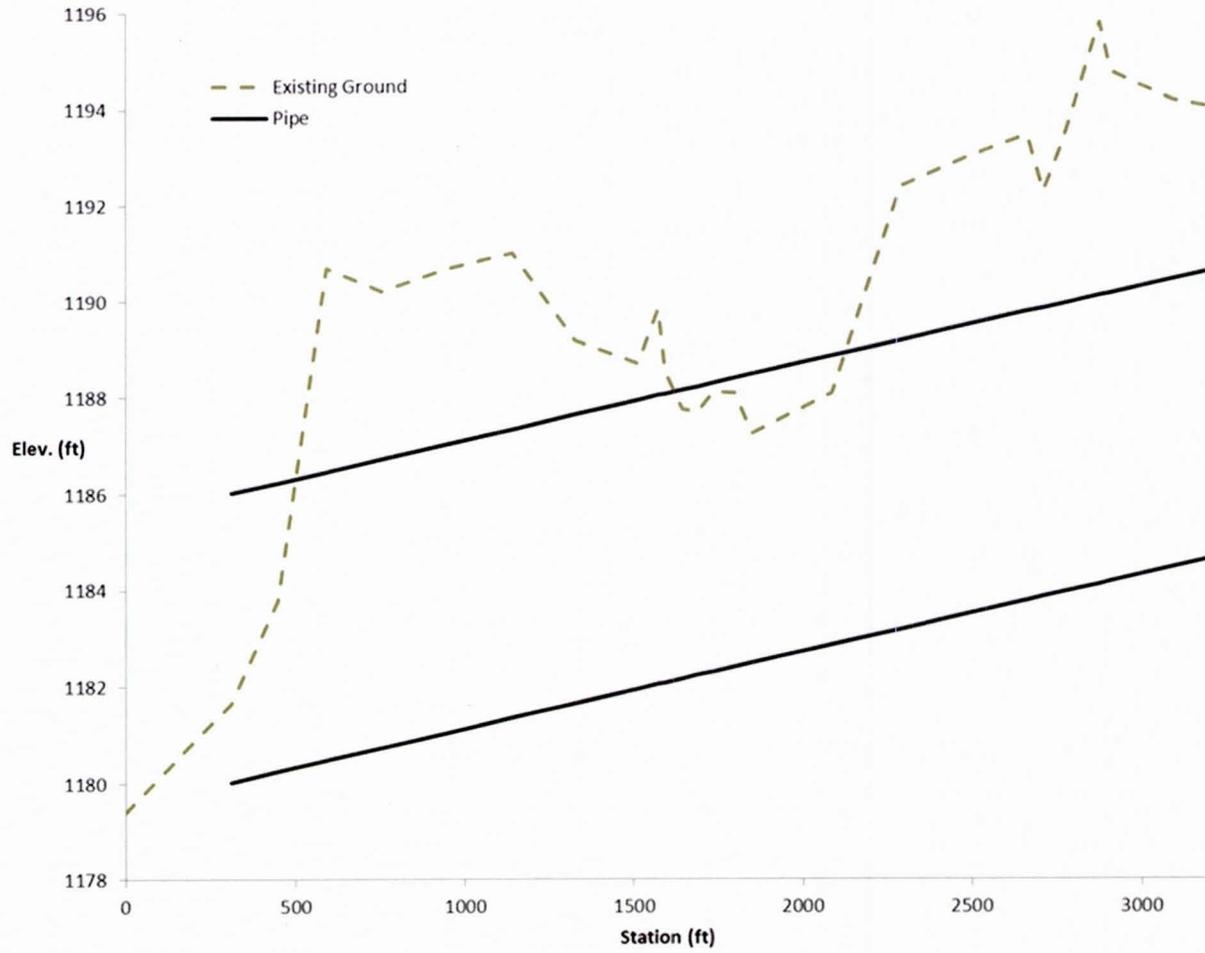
Profile of proposed storm drain from Beardsley Road to Agua Fria
